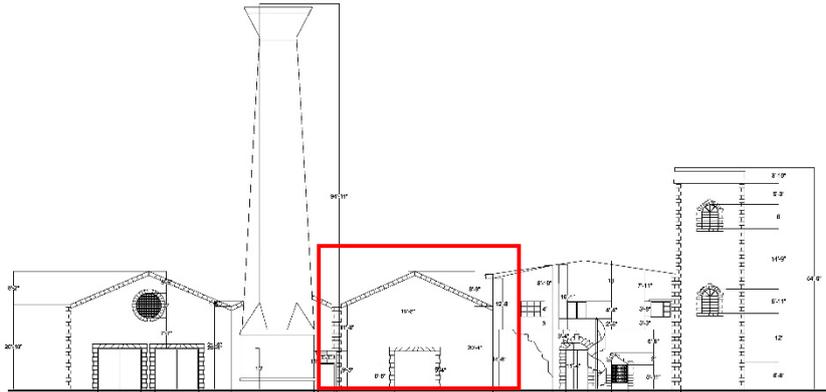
Barrack B, North-West Elevation, 15 to 17A Berth, East Wharf, KPT, Karachi.
